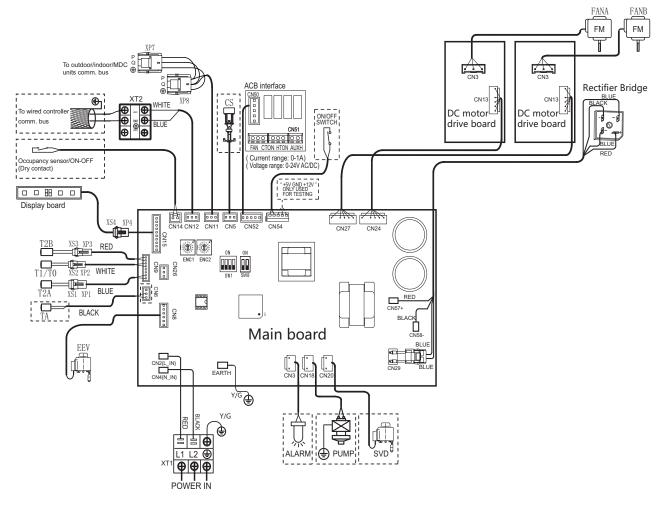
40VMA072-096 Typical Wiring Diagram
